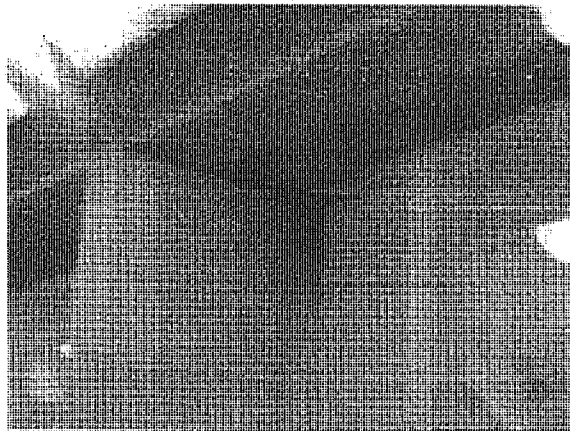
Infrared showing air leakage at column to ceiling/wall transition
